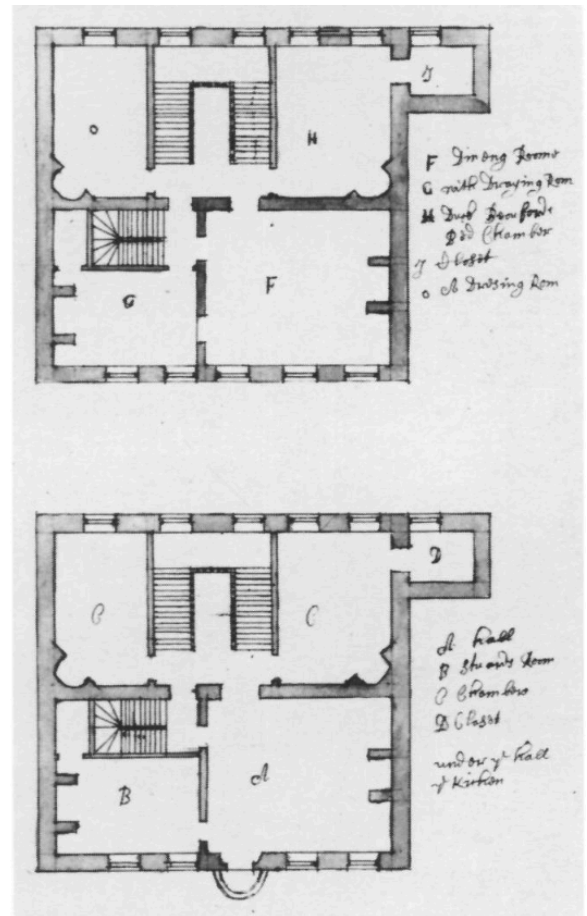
“The Duke of Beauford’s House,” a 17th century “Square Pile” design (Maguire, *A Collection of Seventeenth-Century Architectural Plans*, Fig. 15 No. 88).
